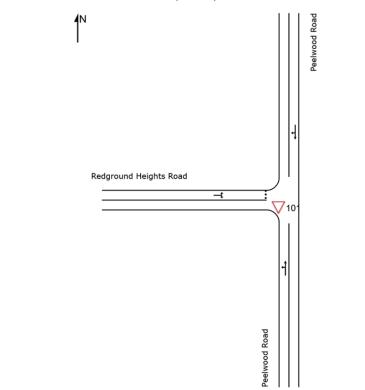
Priority intersection of Peelwood Road with Redground Heights Road (SIDRA)
